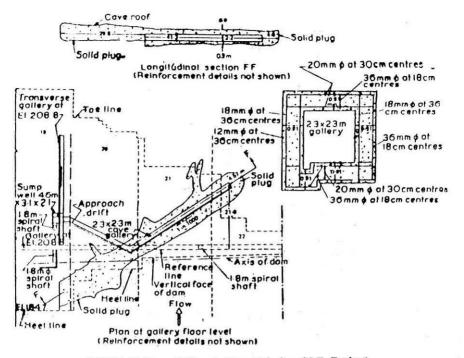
Cave Gallery in Dam (Srisailam H.E. Project)
